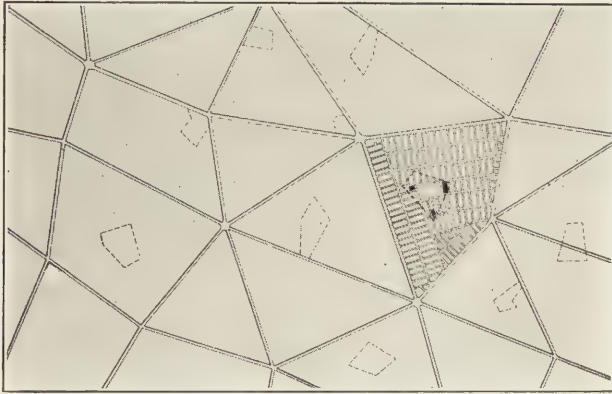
Typical plan showing the development of an arterial street system, making use of existing roads with additional connections and the acquisition of acreage property for small parks, building sites, etc.
